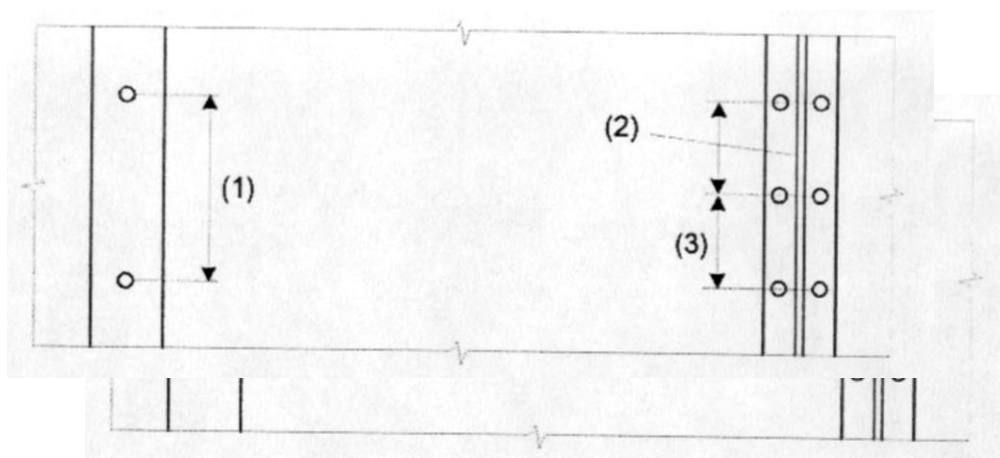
Example of connection of panels not supported by a joist or a rafter 10.8.2 Wall diaphragms
